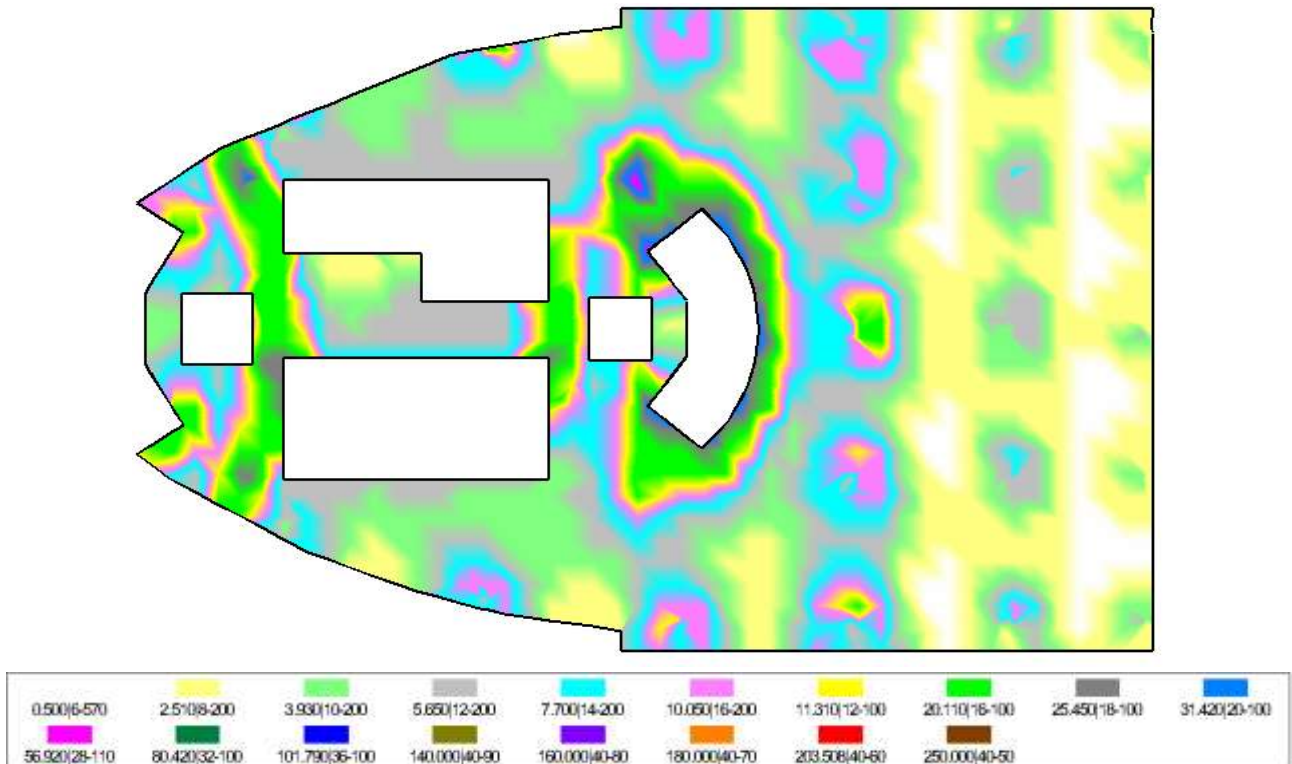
Reinforcement of the floor slab of the eastern tower at +42.80 m. Upper longitudinal reinforcement in the direction of the axis R, cm<sup>2</sup>/m [15]
